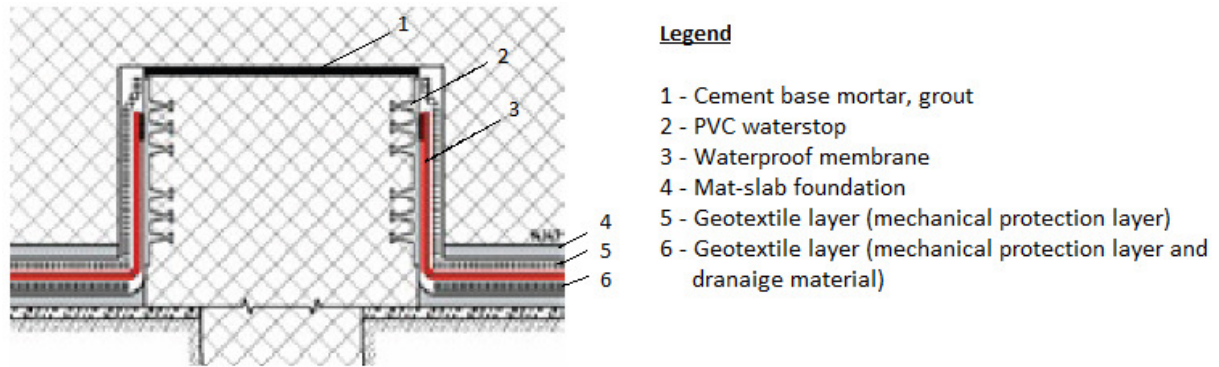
Waterproofing system on the top surface of a mat-slab foundation [personal archive]
